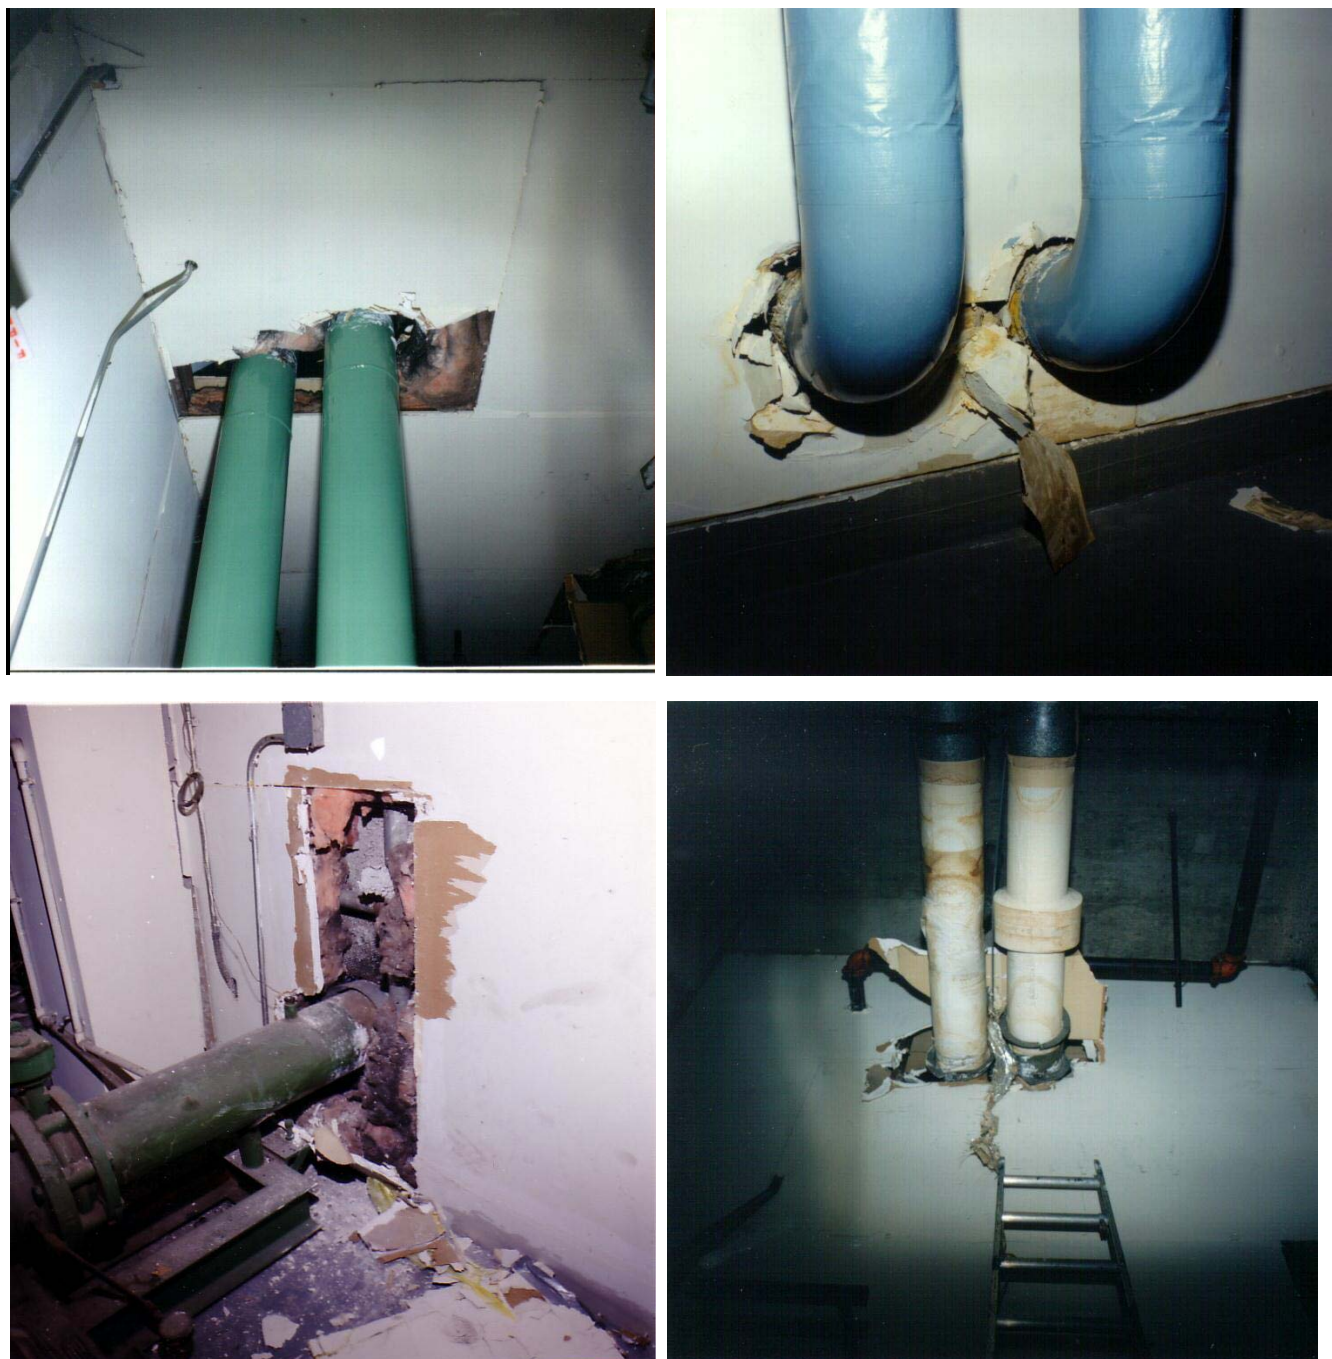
Damage to ceilings, gypsum board partitions, fire-proofing, and insulation in the 1994 magnitude-6.7 Northridge Earthquake (Photo courtesy of Mason Industries). Note that the blue piping has joints located in the wall space which leaked, resulting in additional damage.
